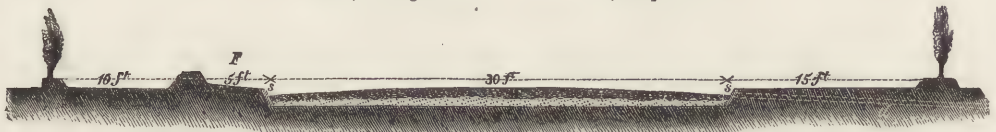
CROSS SECTION OF THE SAME ROAD WHEN IMPROVED.
